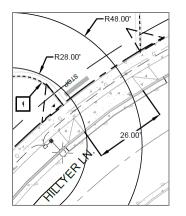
Sheet C5.1 Fire access plan excerpt
